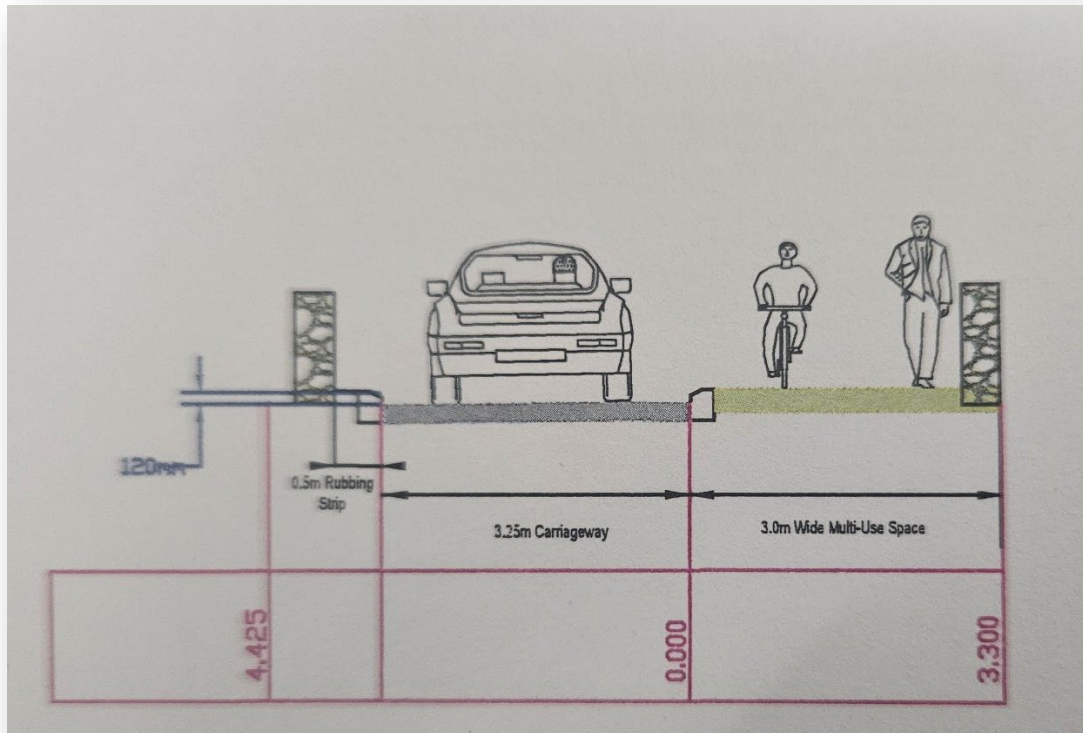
Section B- B in Figure 6 of the McCutcheon Halley submission
